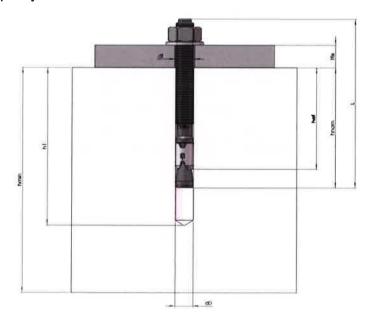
Installed MFT Ekspansjonbolt »Varmforsinket« anchor
